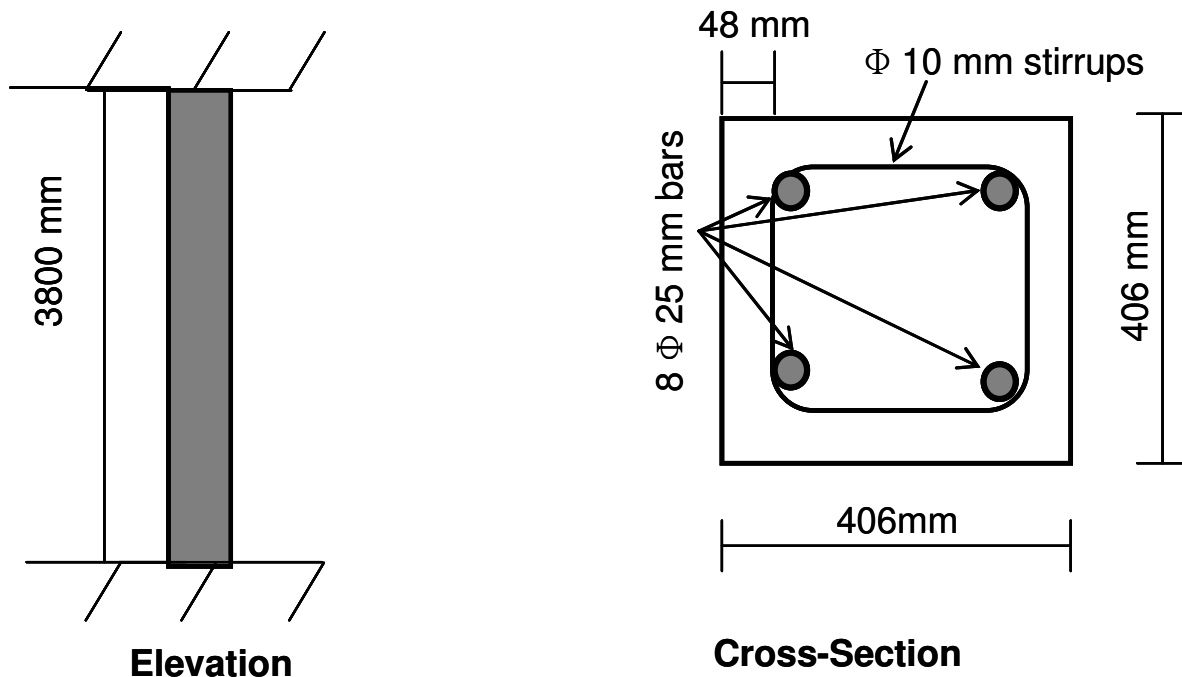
Elevation and cross-sectional details of Columns III14 [Lie and Woolerton, 1988]
